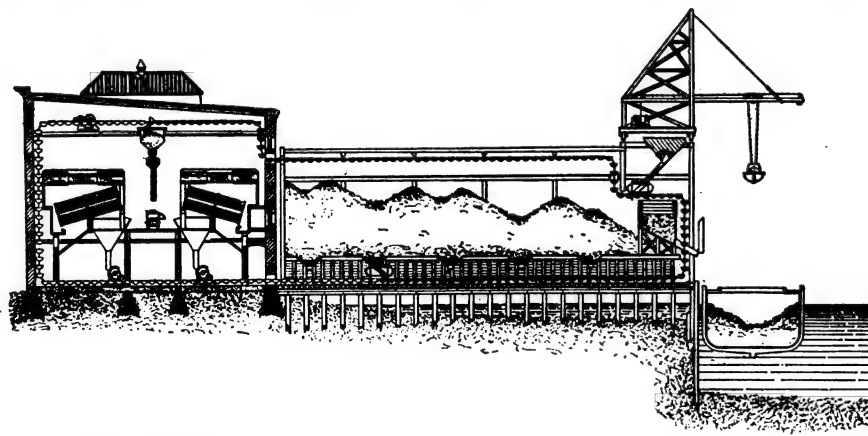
ARRANGEMENT OF COAL AND ASH-HANDLING PLANT—BOSTON EDISON STATION.
